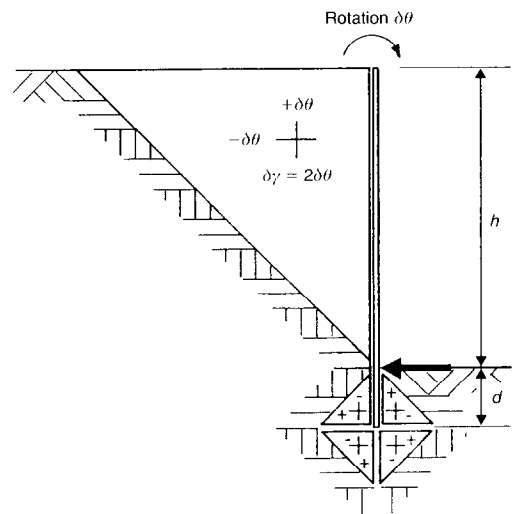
Kinematically admissible strain field for wall propped at excavation base: undrained soil
